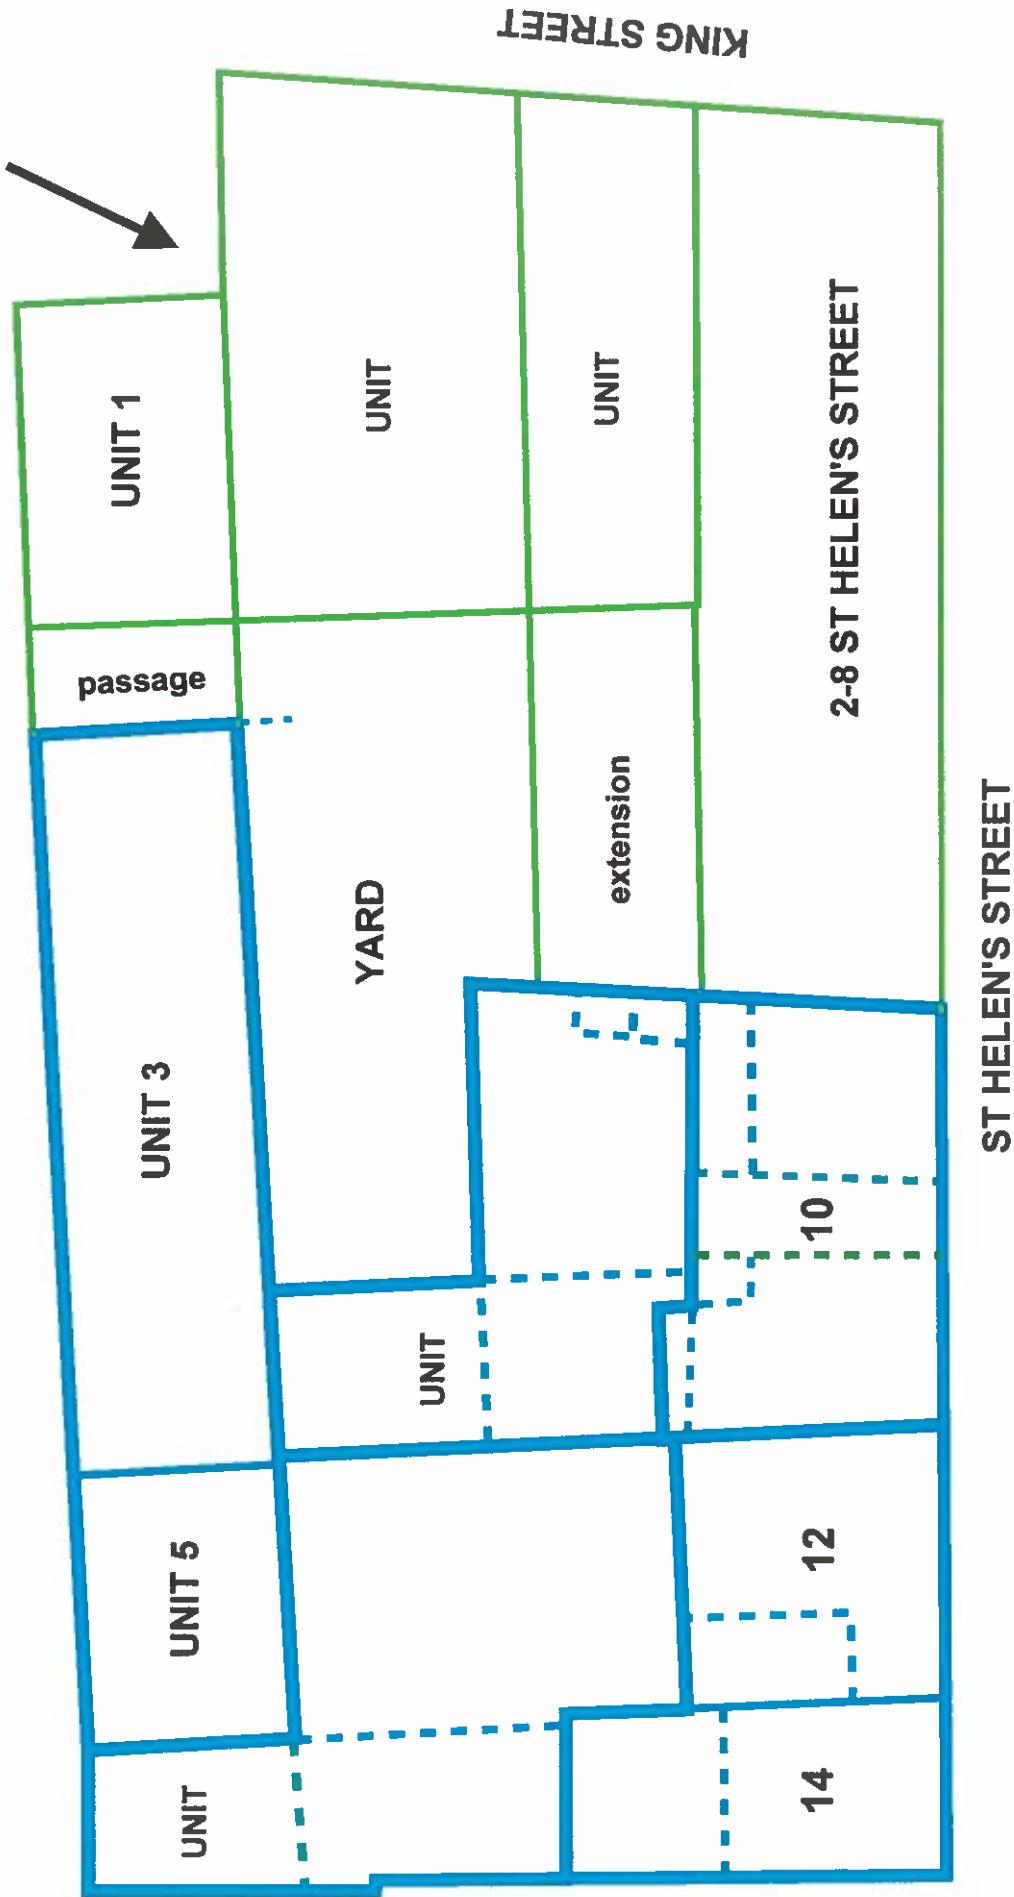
The separate buildings, extensions and workshop units at the north-west corner of St Helen's Street and King Street, Derby.
